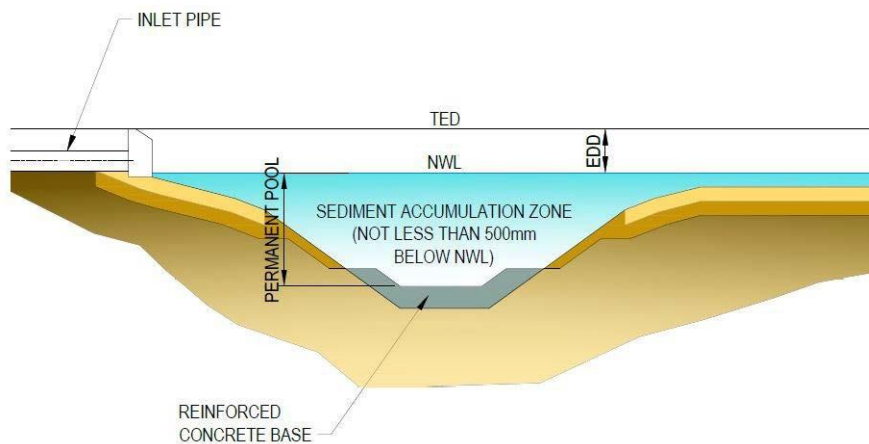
12 Typical sediment forebay section (after Melbourne Water, 2016)
